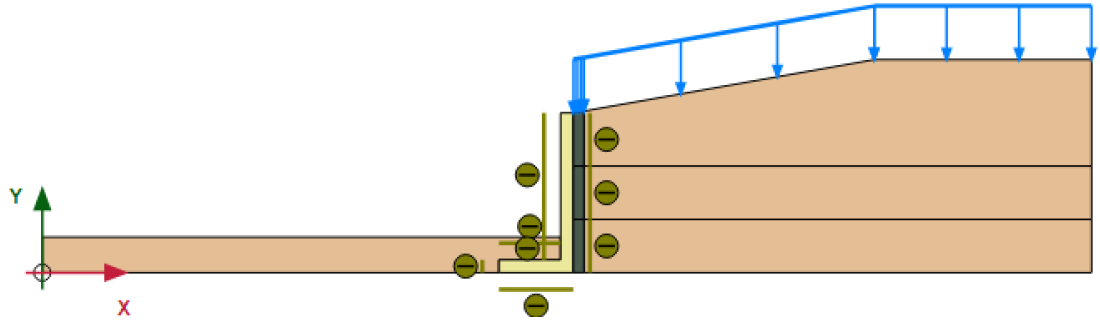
Retaining wall with backfill slope 10° and 0.3m TDA backfill
